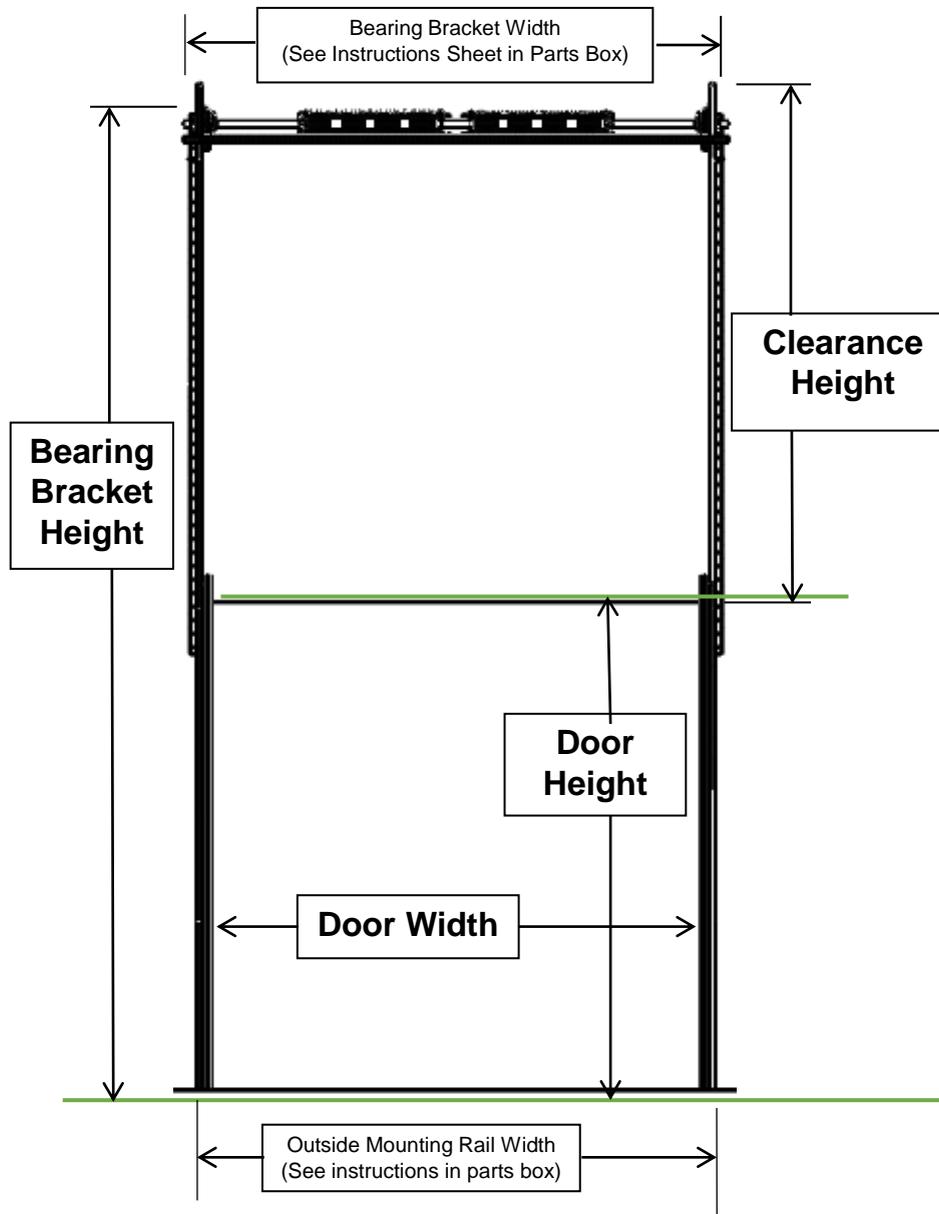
Key measurements and locations of mounting rails and end bearing assemblies.
